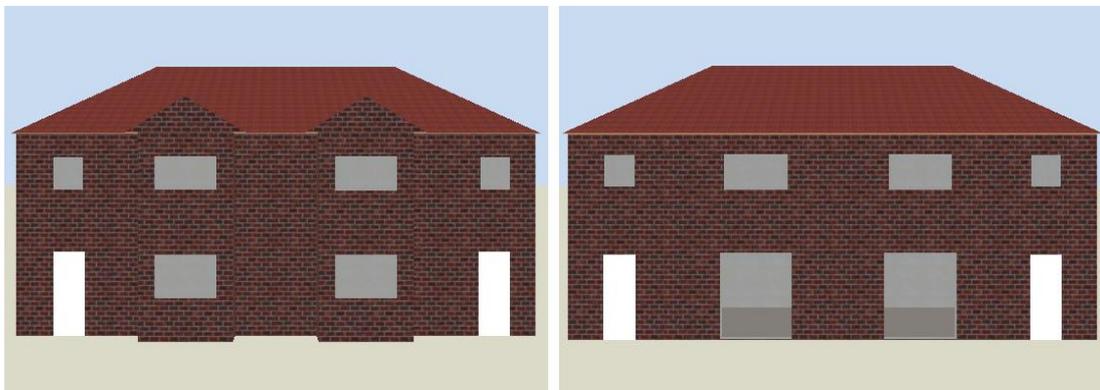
Front (left) and back (right) view of the semi-detached A&P house model in DesignBuilder
